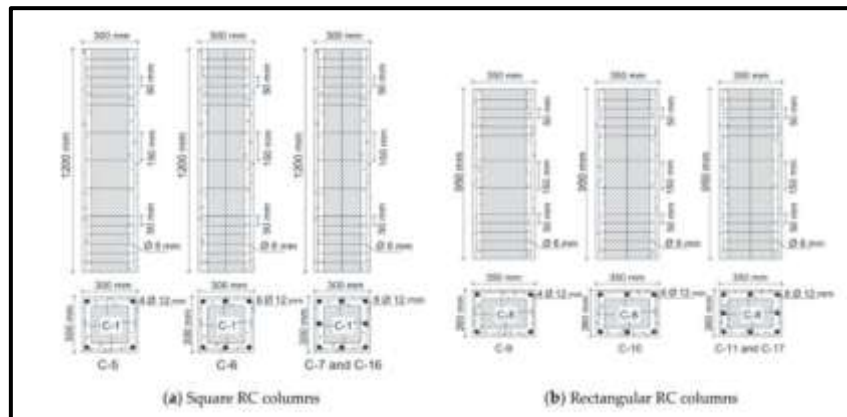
Illustrates the detailed configuration of the reinforced concrete (RC) columns that were strengthened using the full (complete) RC jacketing technique[32].
